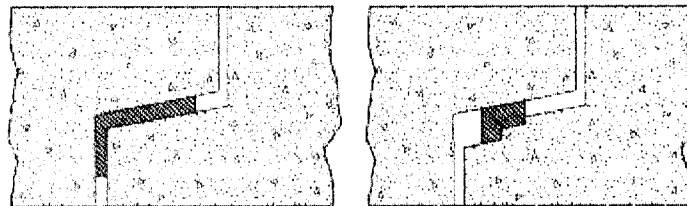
Typical cross sections of basic compression type rubber gasket joints
